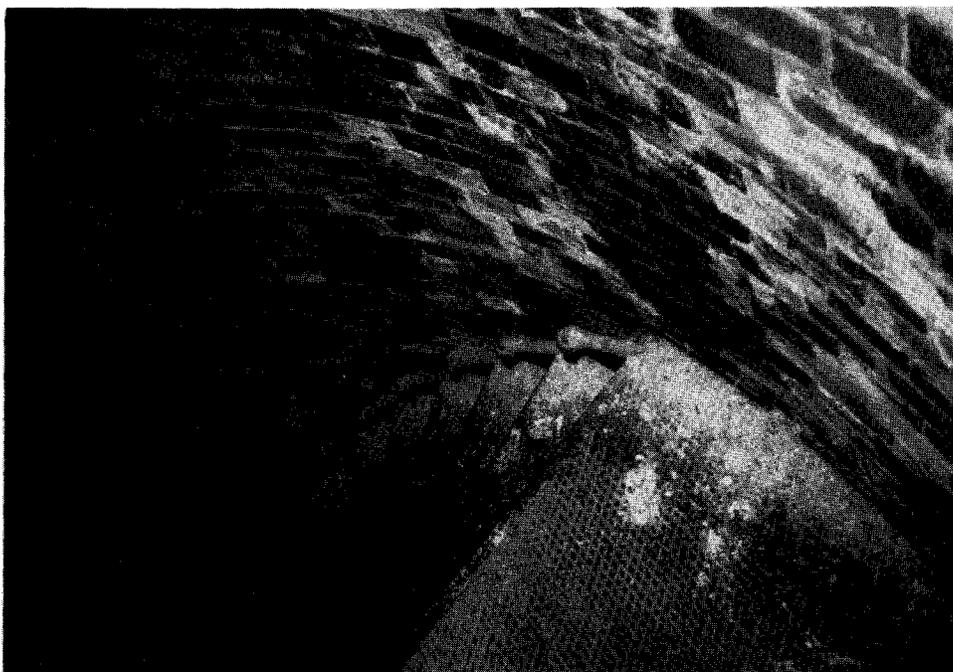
Tower, deposits of salt crystals and brick dust at steps and stair landing, east wall of First Level.
